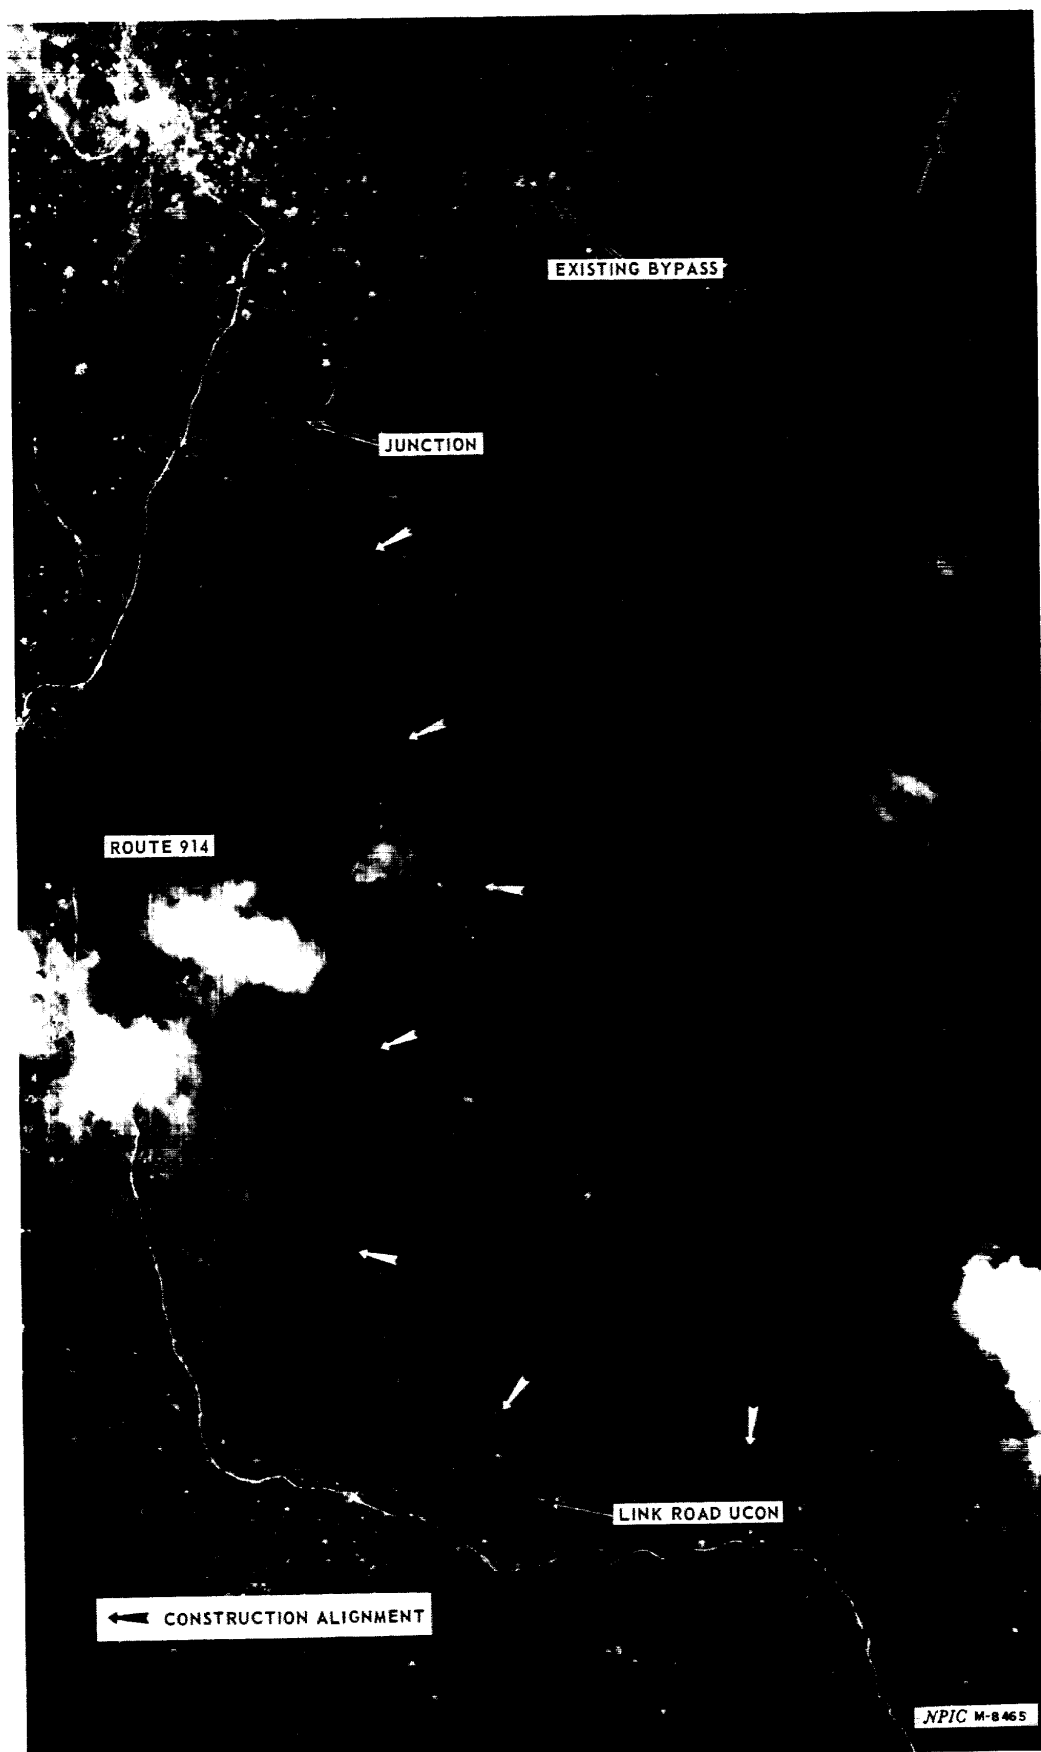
ROAD SEGMENT UNDER CONSTRUCTION, LAOS
